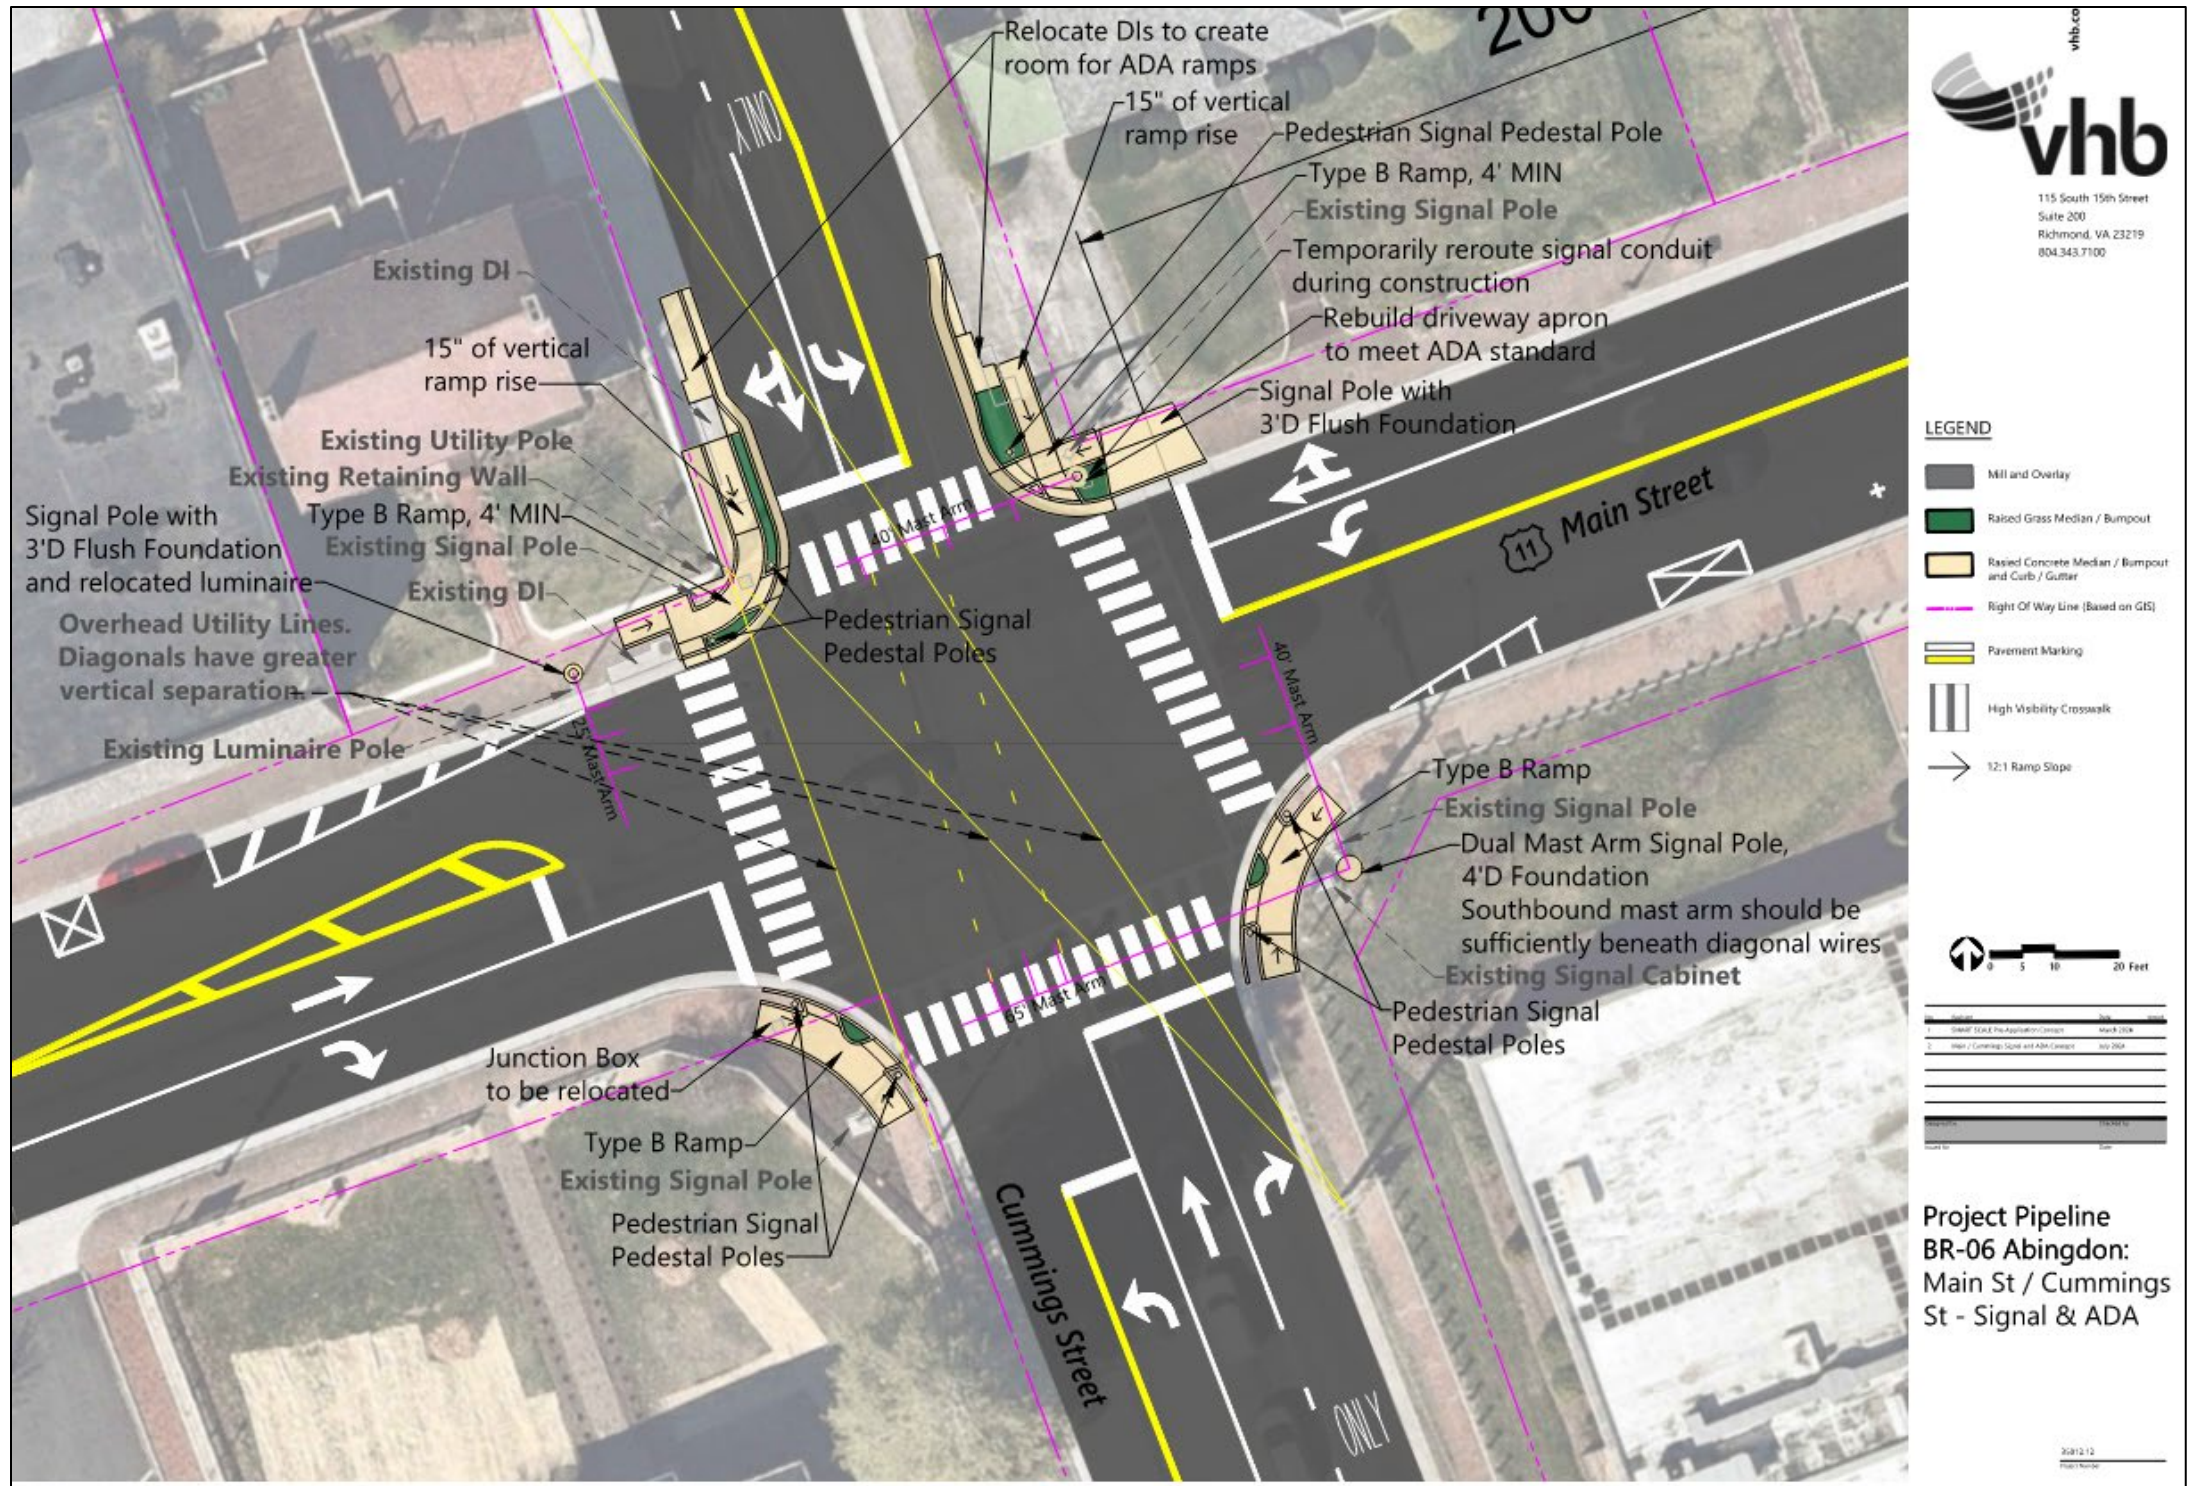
Detailed Conceptual Design for Main Street / Cummings Street Intersection
